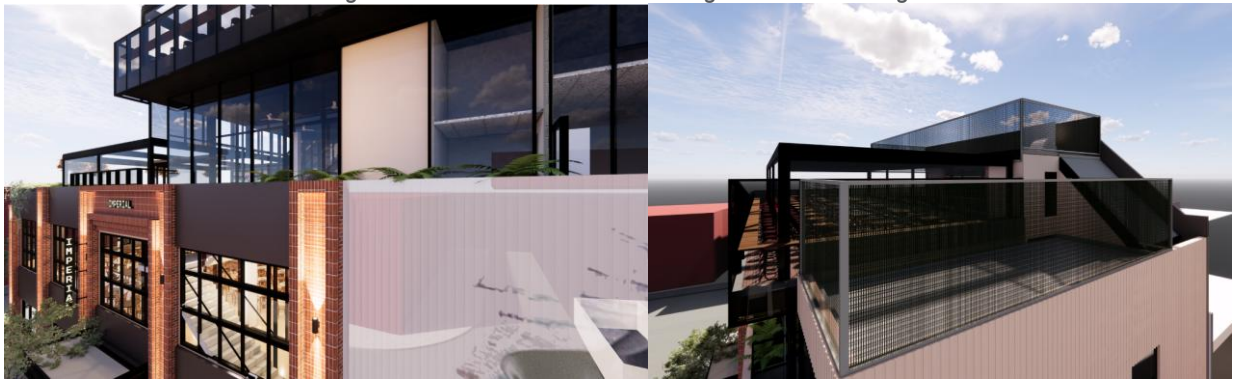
Render of Level 3 terrace when viewed from Palermo Street (left) and Forster Street (right)
